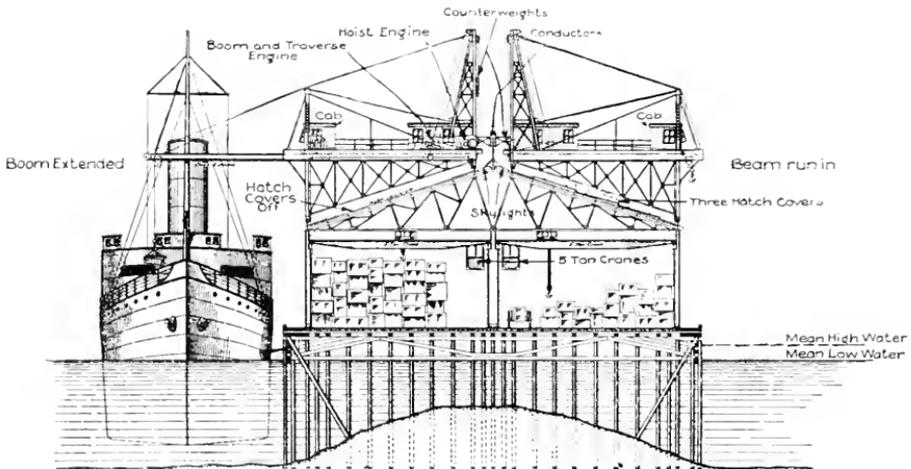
Straight Line Motion Roof Crane for Use on Narrow Piers Where Space Does Not Permit the Use of Half or Full Arch Gantry Cranes
